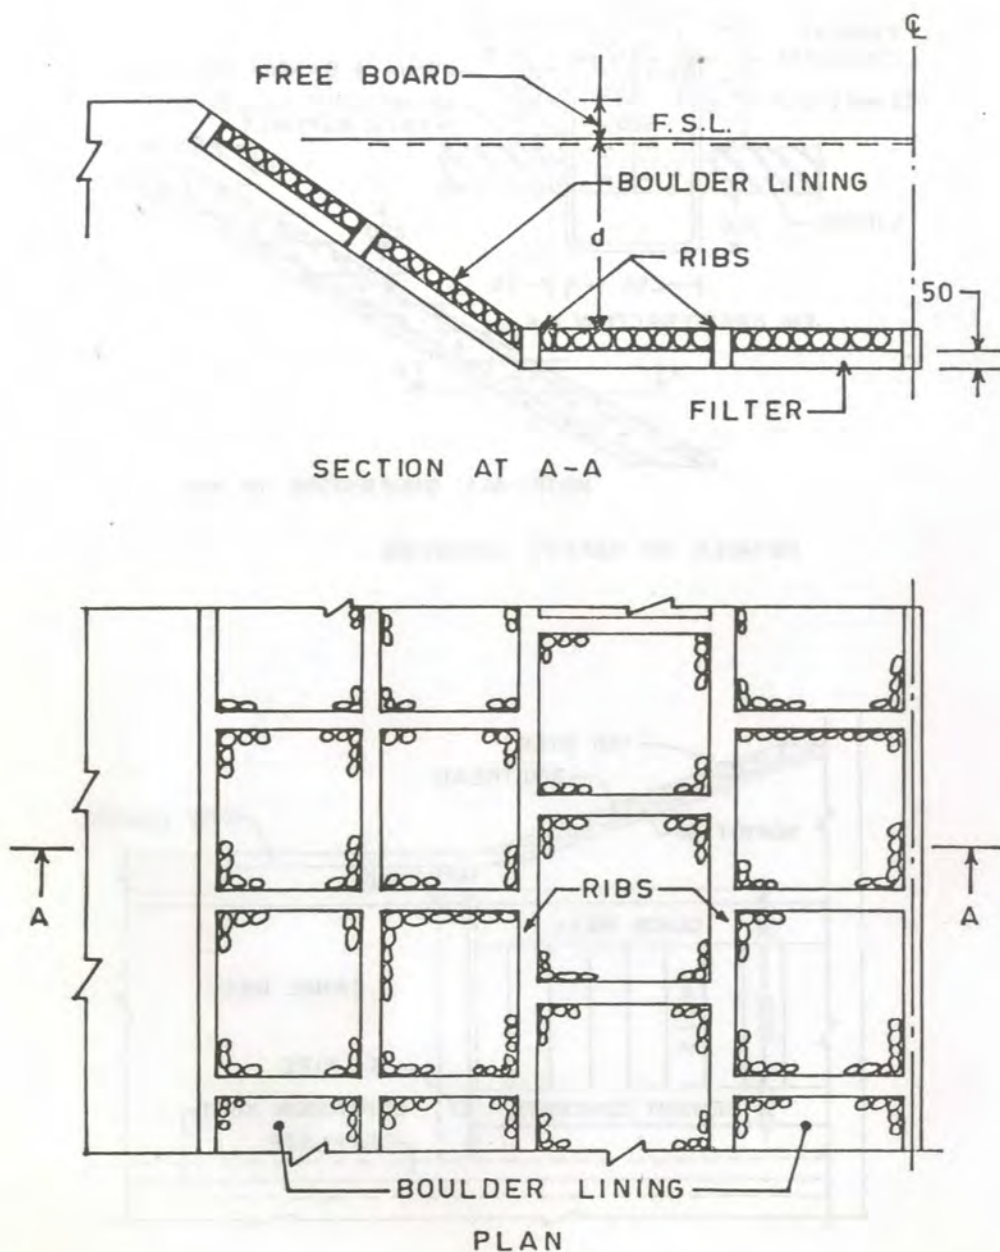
ILLUSTRATORY LAYOUT OF STONE PITCHED LINING FOR CANALS.
